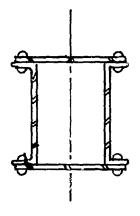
TRUSS DIAGONAL REPLACEMENT FOR RIVETED OR BOLTED CONNECTION
